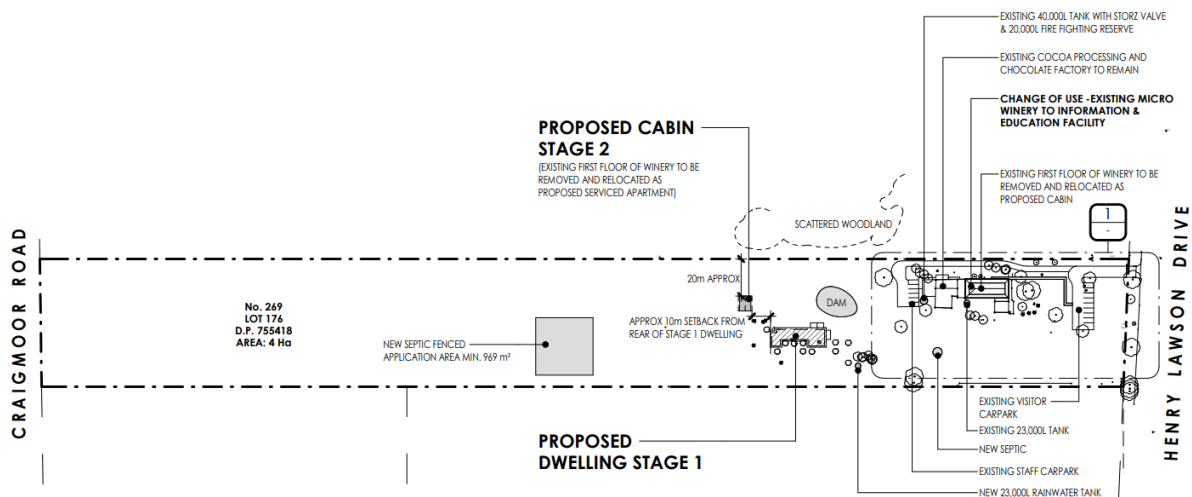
LAYOUT (SUNRAI DESIGNS)
